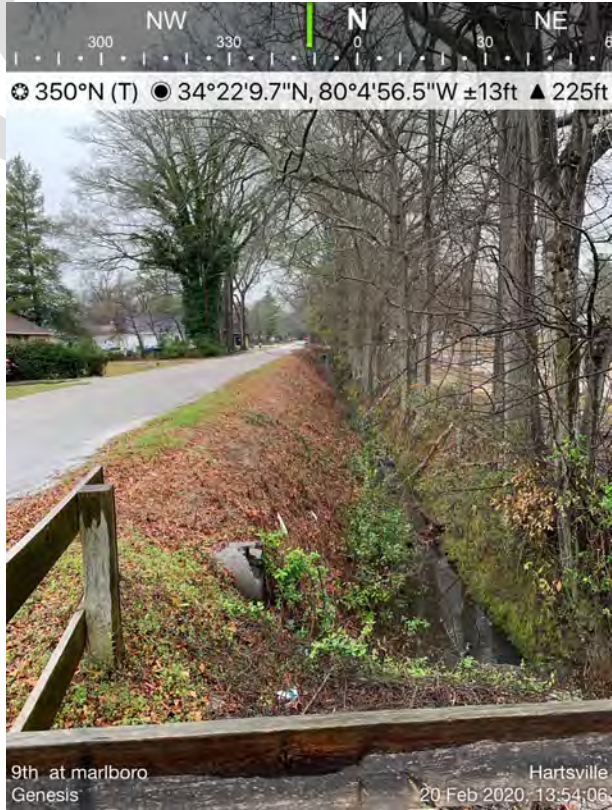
Ninth Street Ditch at Marlboro Avenue and Ninth Street. Looking upstream. Thornwell School of the Arts is located on the left.
